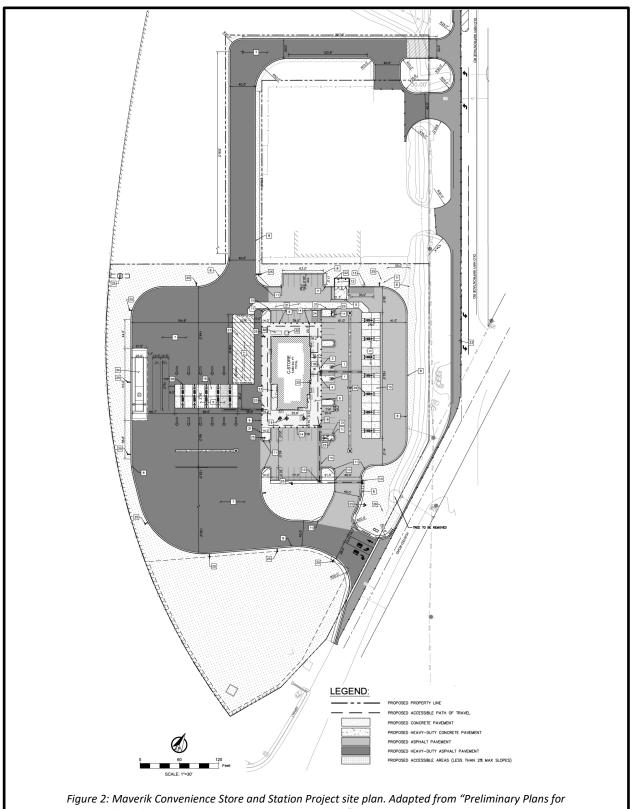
Maverik Convenience Store and Station Project site plan. Adapted from "Preliminary Plans for Maverik Fueling Center, APN: 016-320-110-000 Parcel" by A., J Design and Consulting Engineers.
